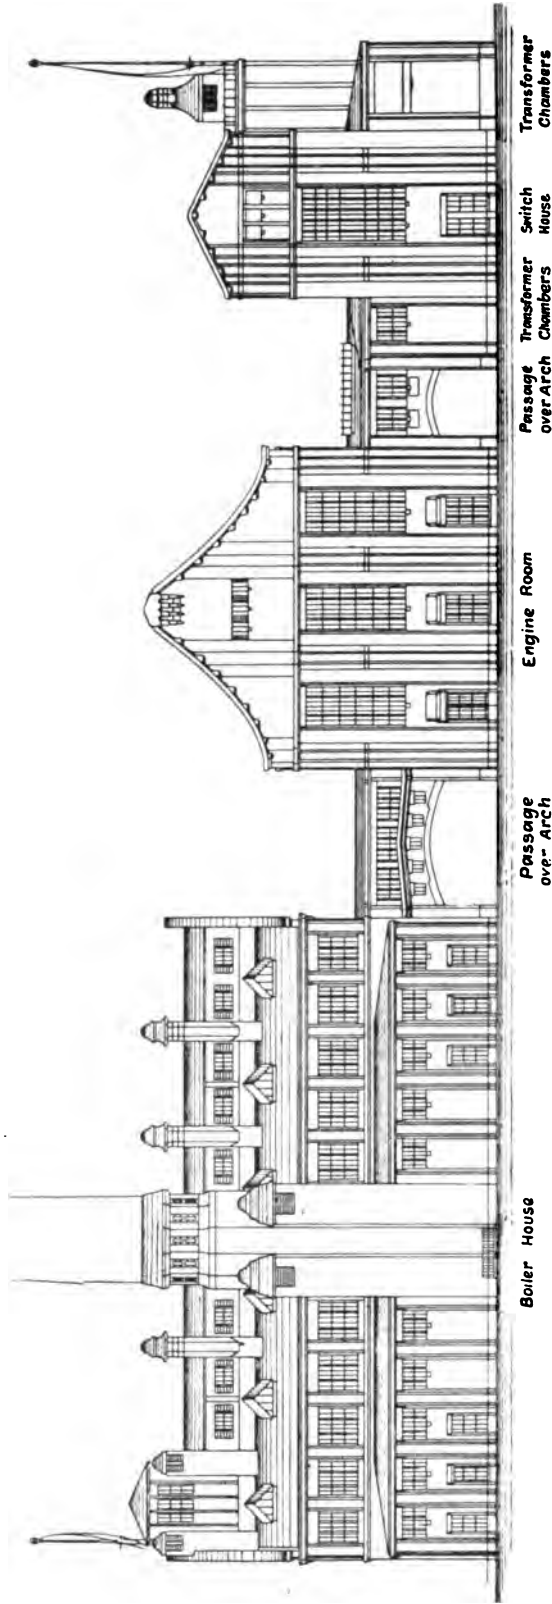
Architectural Example —Façade of the Fortuna Electricity Works.
